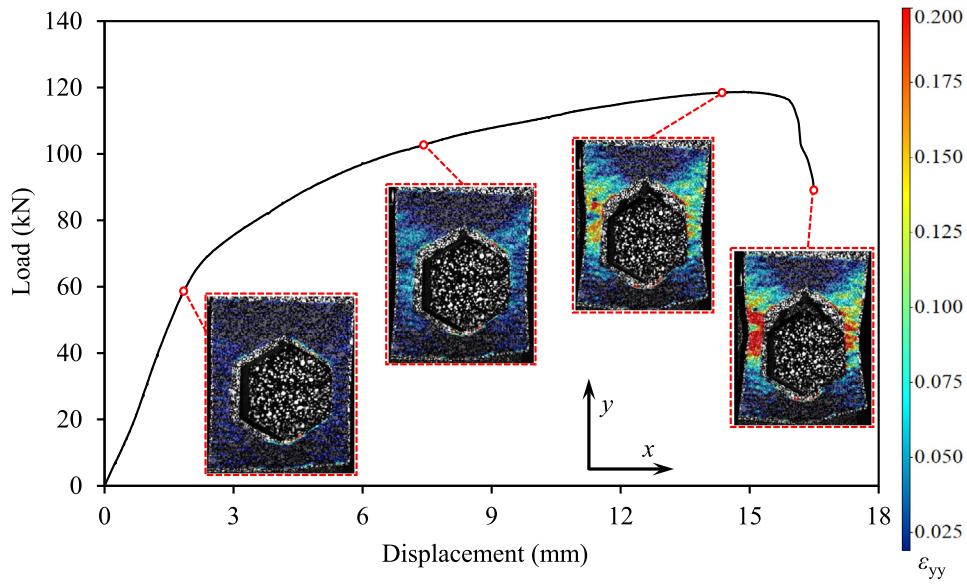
Strain fields at different loading levels for a specimen (specimen S8-65-39-90) failing by net section tension.
